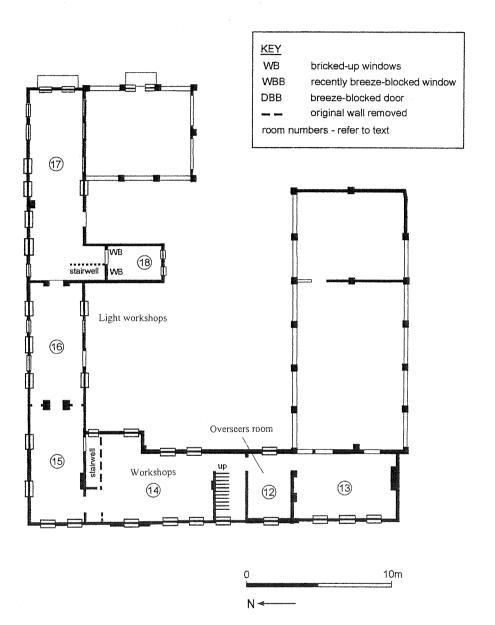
First floor plan (Based on original drawings by BLB Architects of Redditch)
